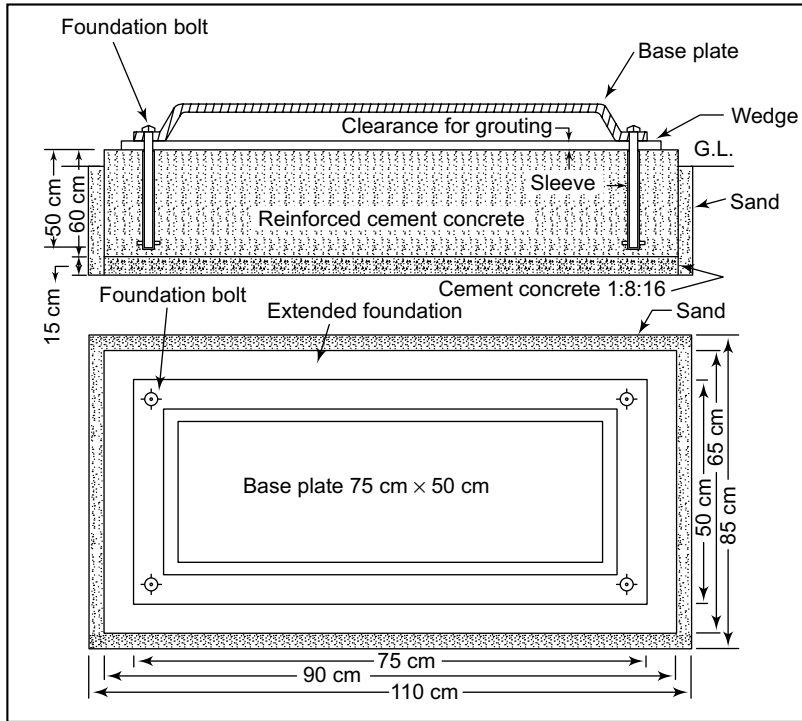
Detail of the foundation for the installation of an engine/motor operated centrifugal pump (Example 10.4).
